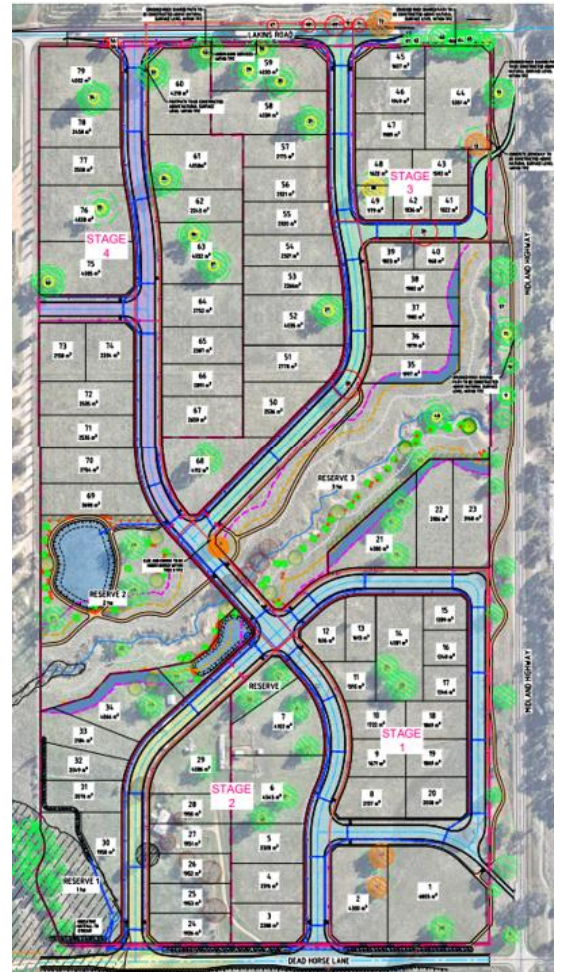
Development Plans-1.0-Trafficworks - FINAL
